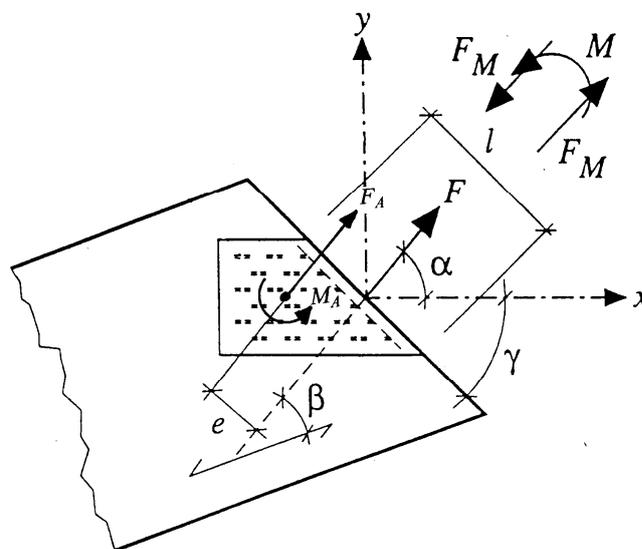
Geometry of nail plate connection loaded by a force F and moment M .
